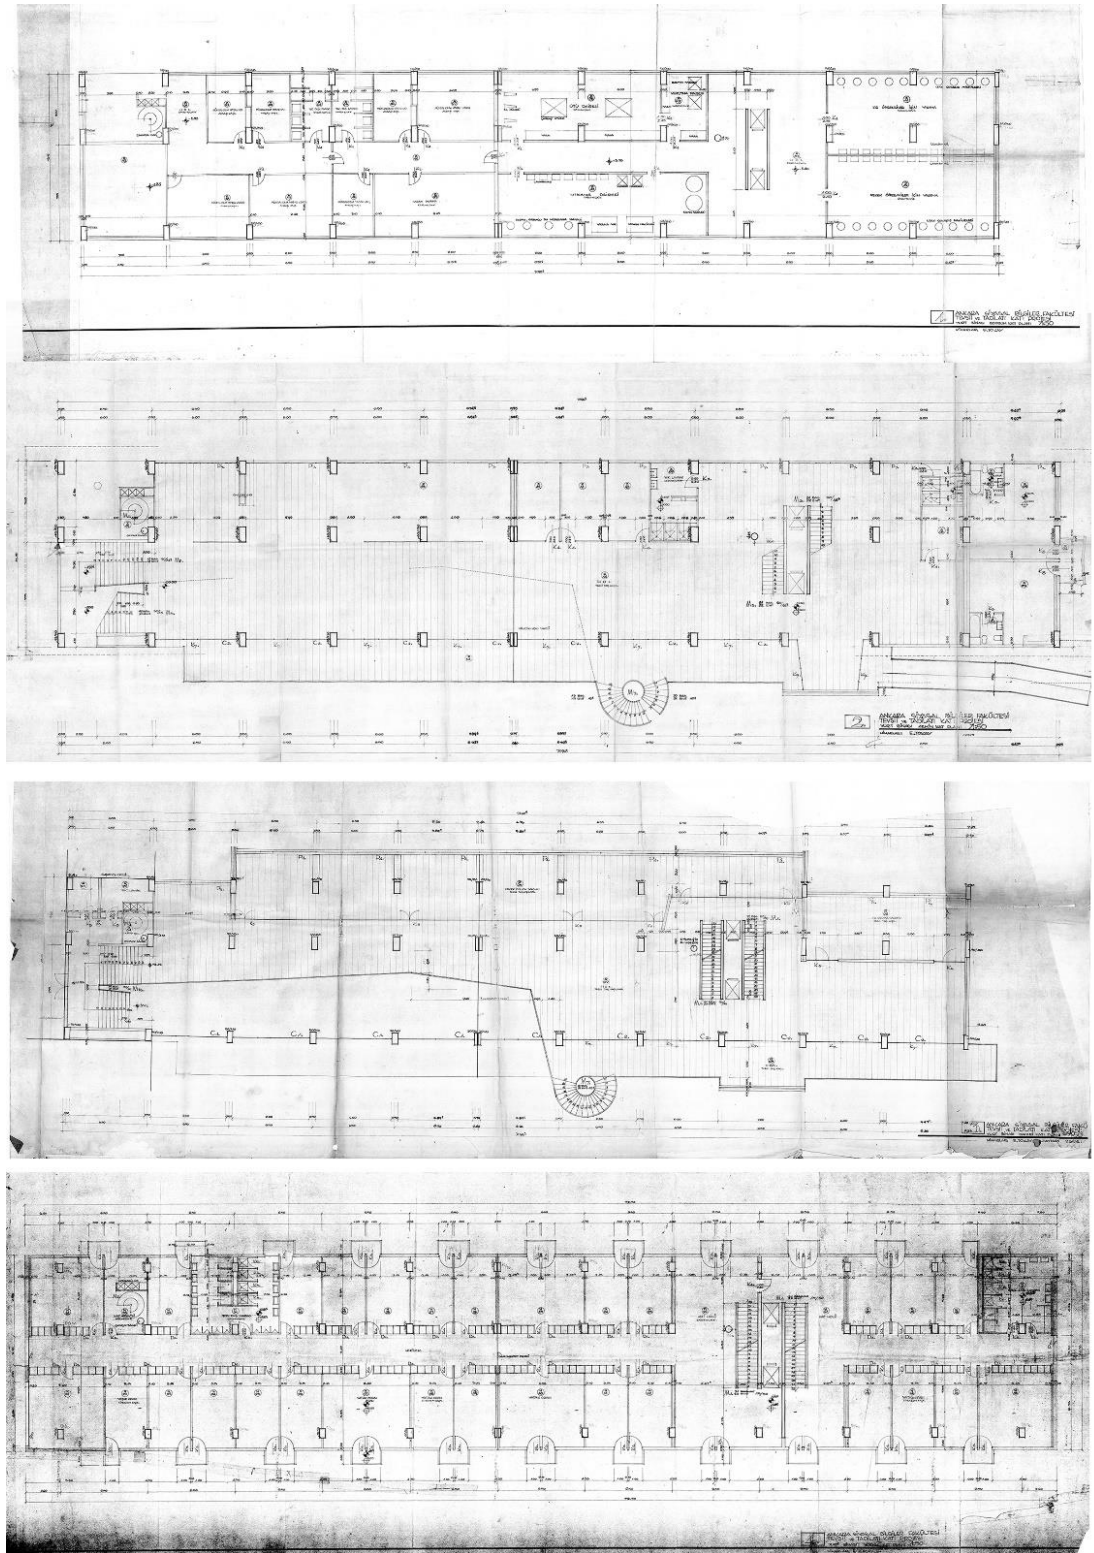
Original basement, ground, mezzanine and typical floor plans of the dormitory building (archive of Ankara University Directorate of Construction and Technical Works)
